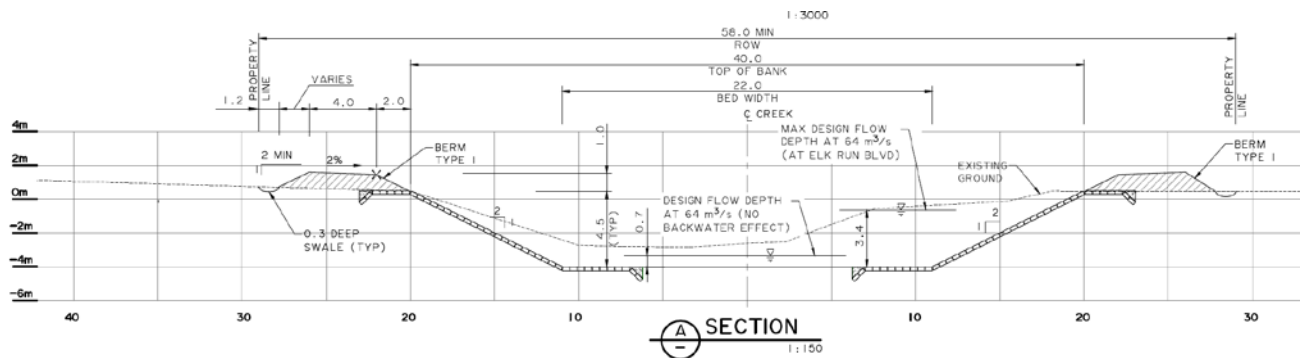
Design of the channel reinforcement (ISL Engineering, 2013)
